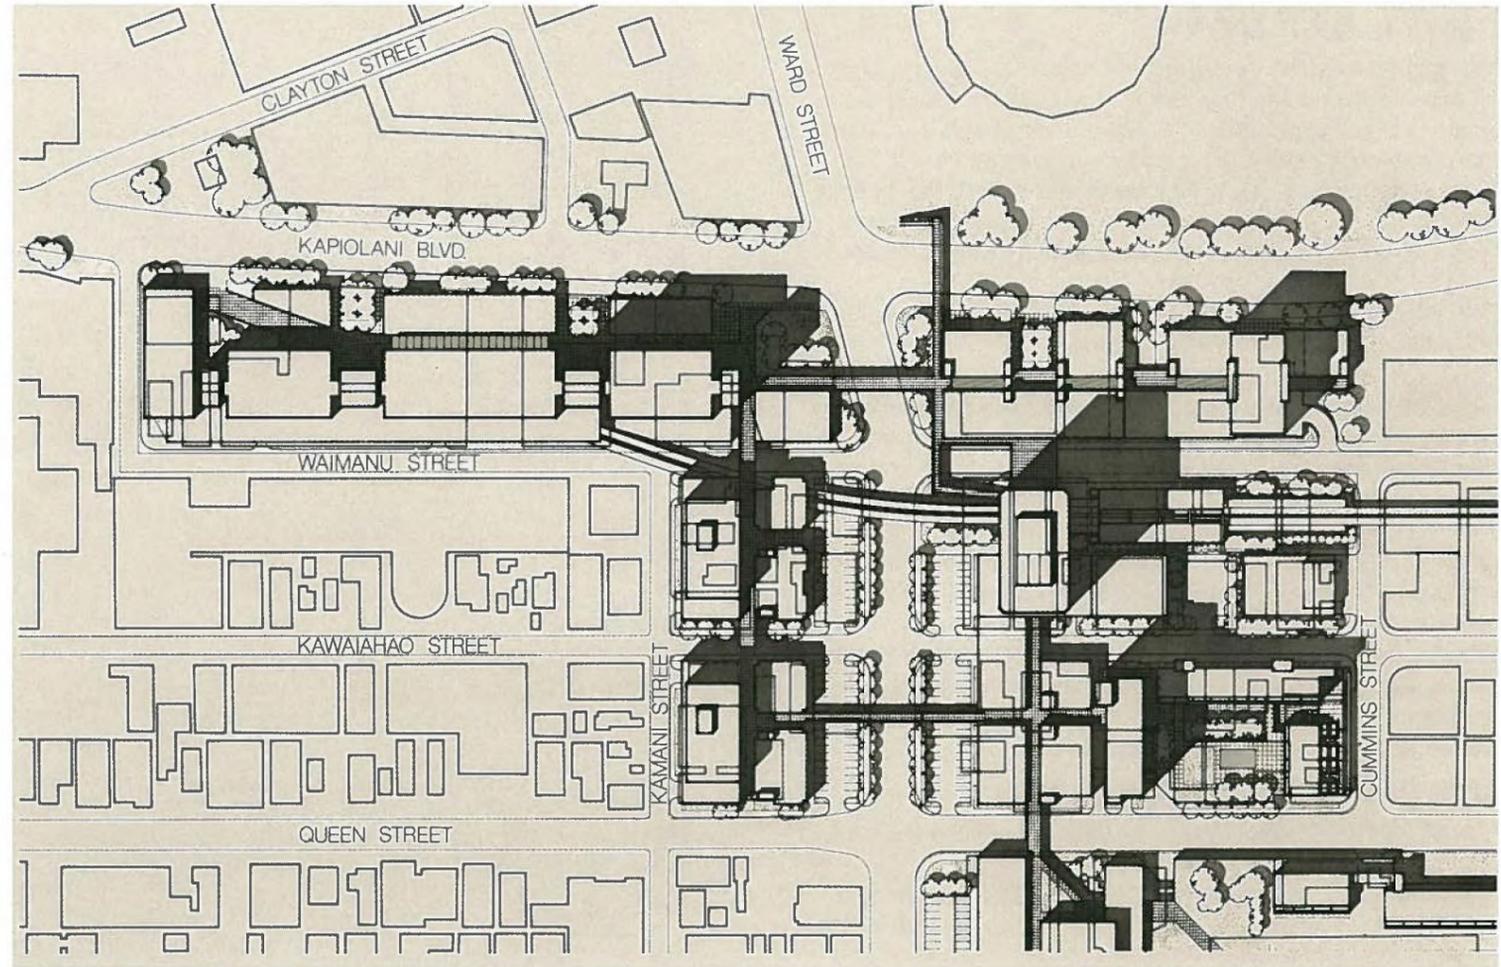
Ward Avenue Site Plan of Urban Design Concept
